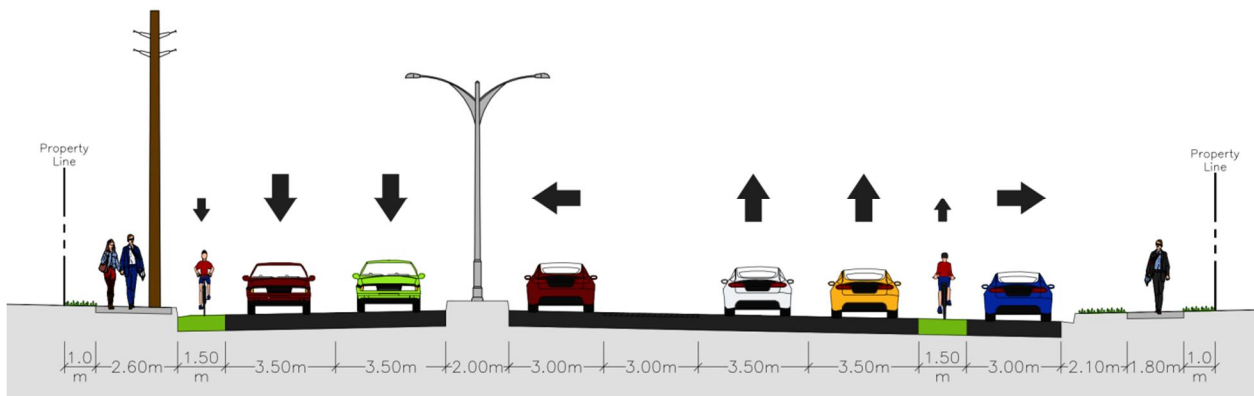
Preferred Design, Hamilton Road Cross-Section, West of Highbury Avenue North
